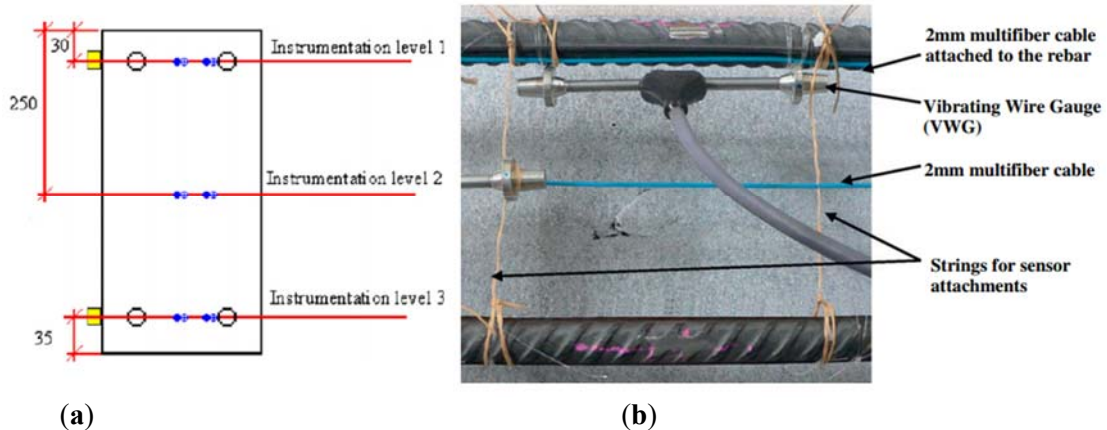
(a) details of the cross-sectional instrumentation at mid-span of the beam (dimensions in mm); (b) Picture of the instrumented beam before concrete pouring (adapted from [92]).
